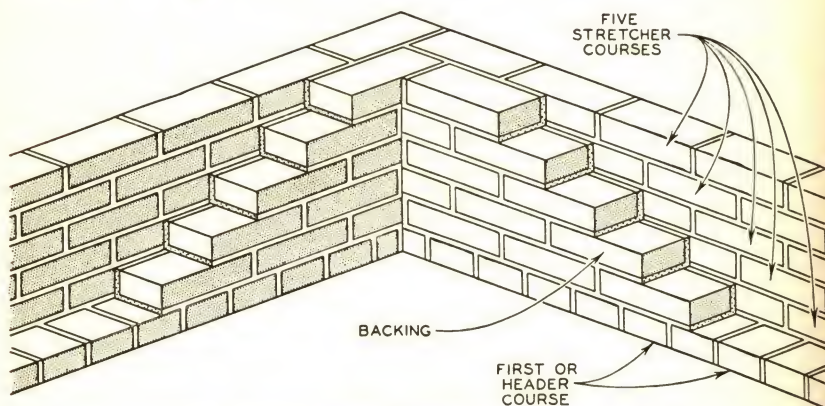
Backing for Corner of Eight-Inch Brick Wall
